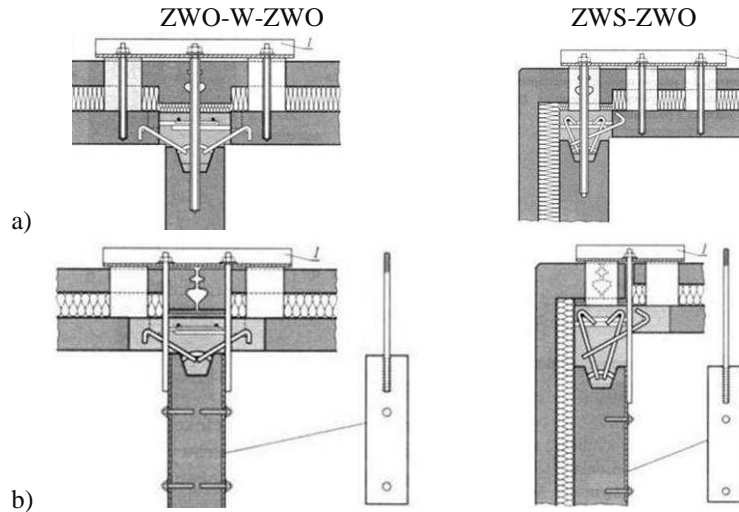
Examples of mechanical strengthening of vertical joints from the outside of a building: a) with application of screws (for adequate concrete strength), b) with application of anchors (for inadequate concrete strength) [18]
